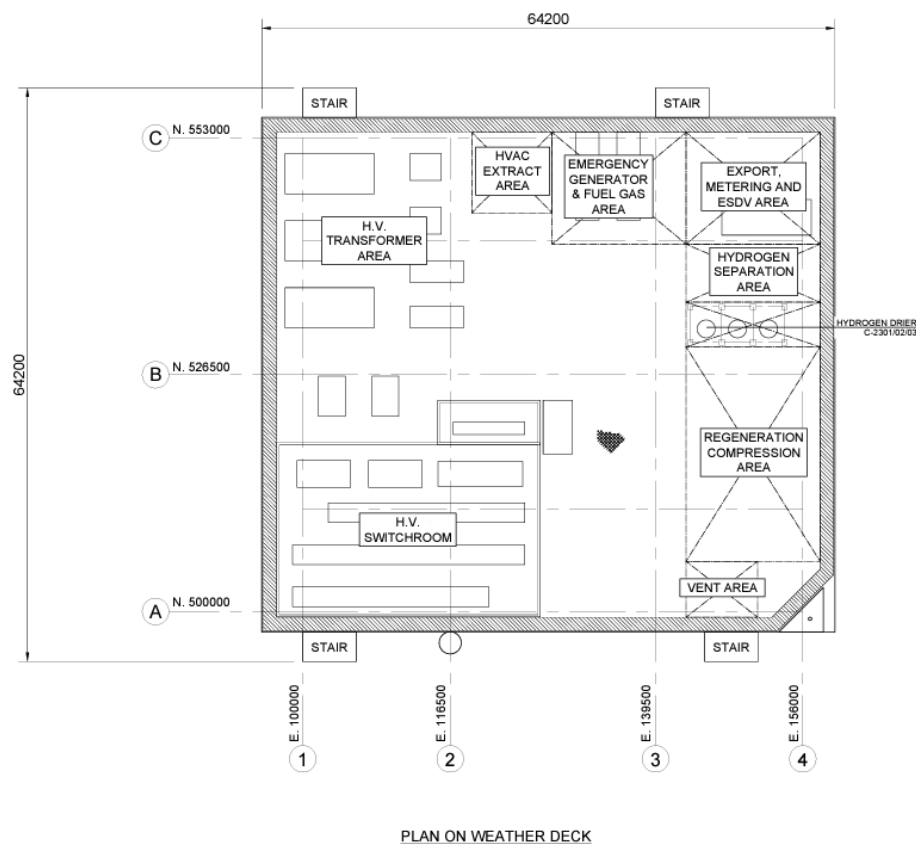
Block Layout of 300 MW Centralized Electrolysis Platform at Weather Deck Elevation
